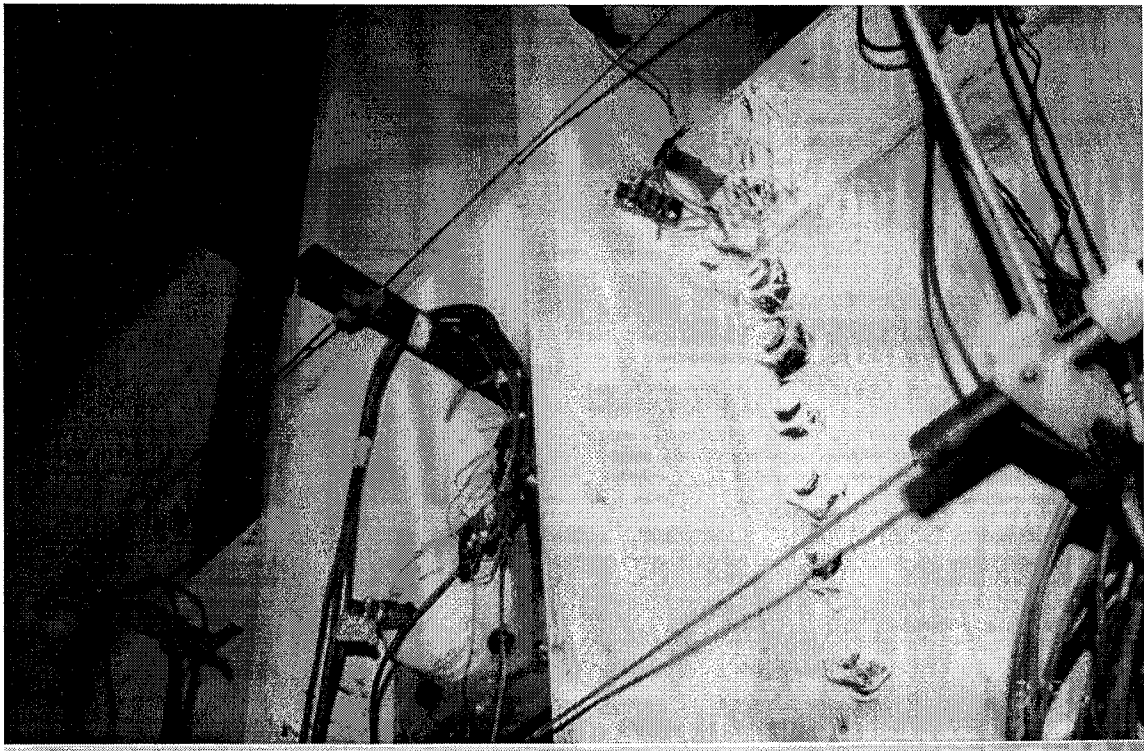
NW Connection Region (West Girder of Specimen 1)
